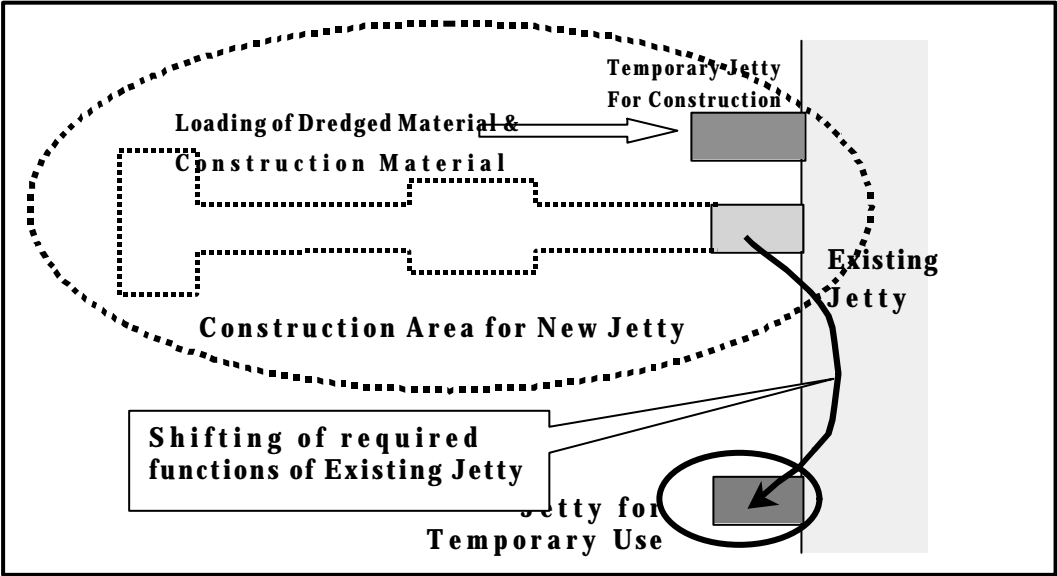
Layout Plan of Temporary Onshore Facility
